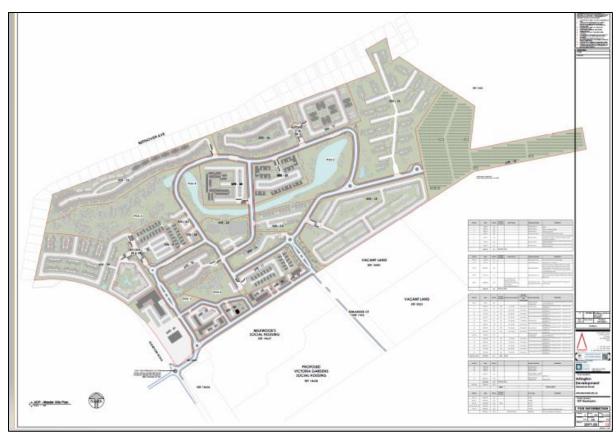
Master Layout Plan of the proposed Arlington mixed-use development.
